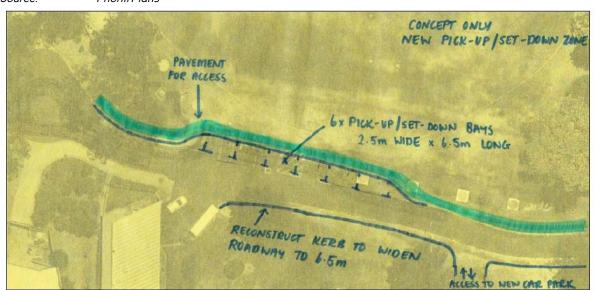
Proposed Pick-Up/Set-Down Design for Primary School
